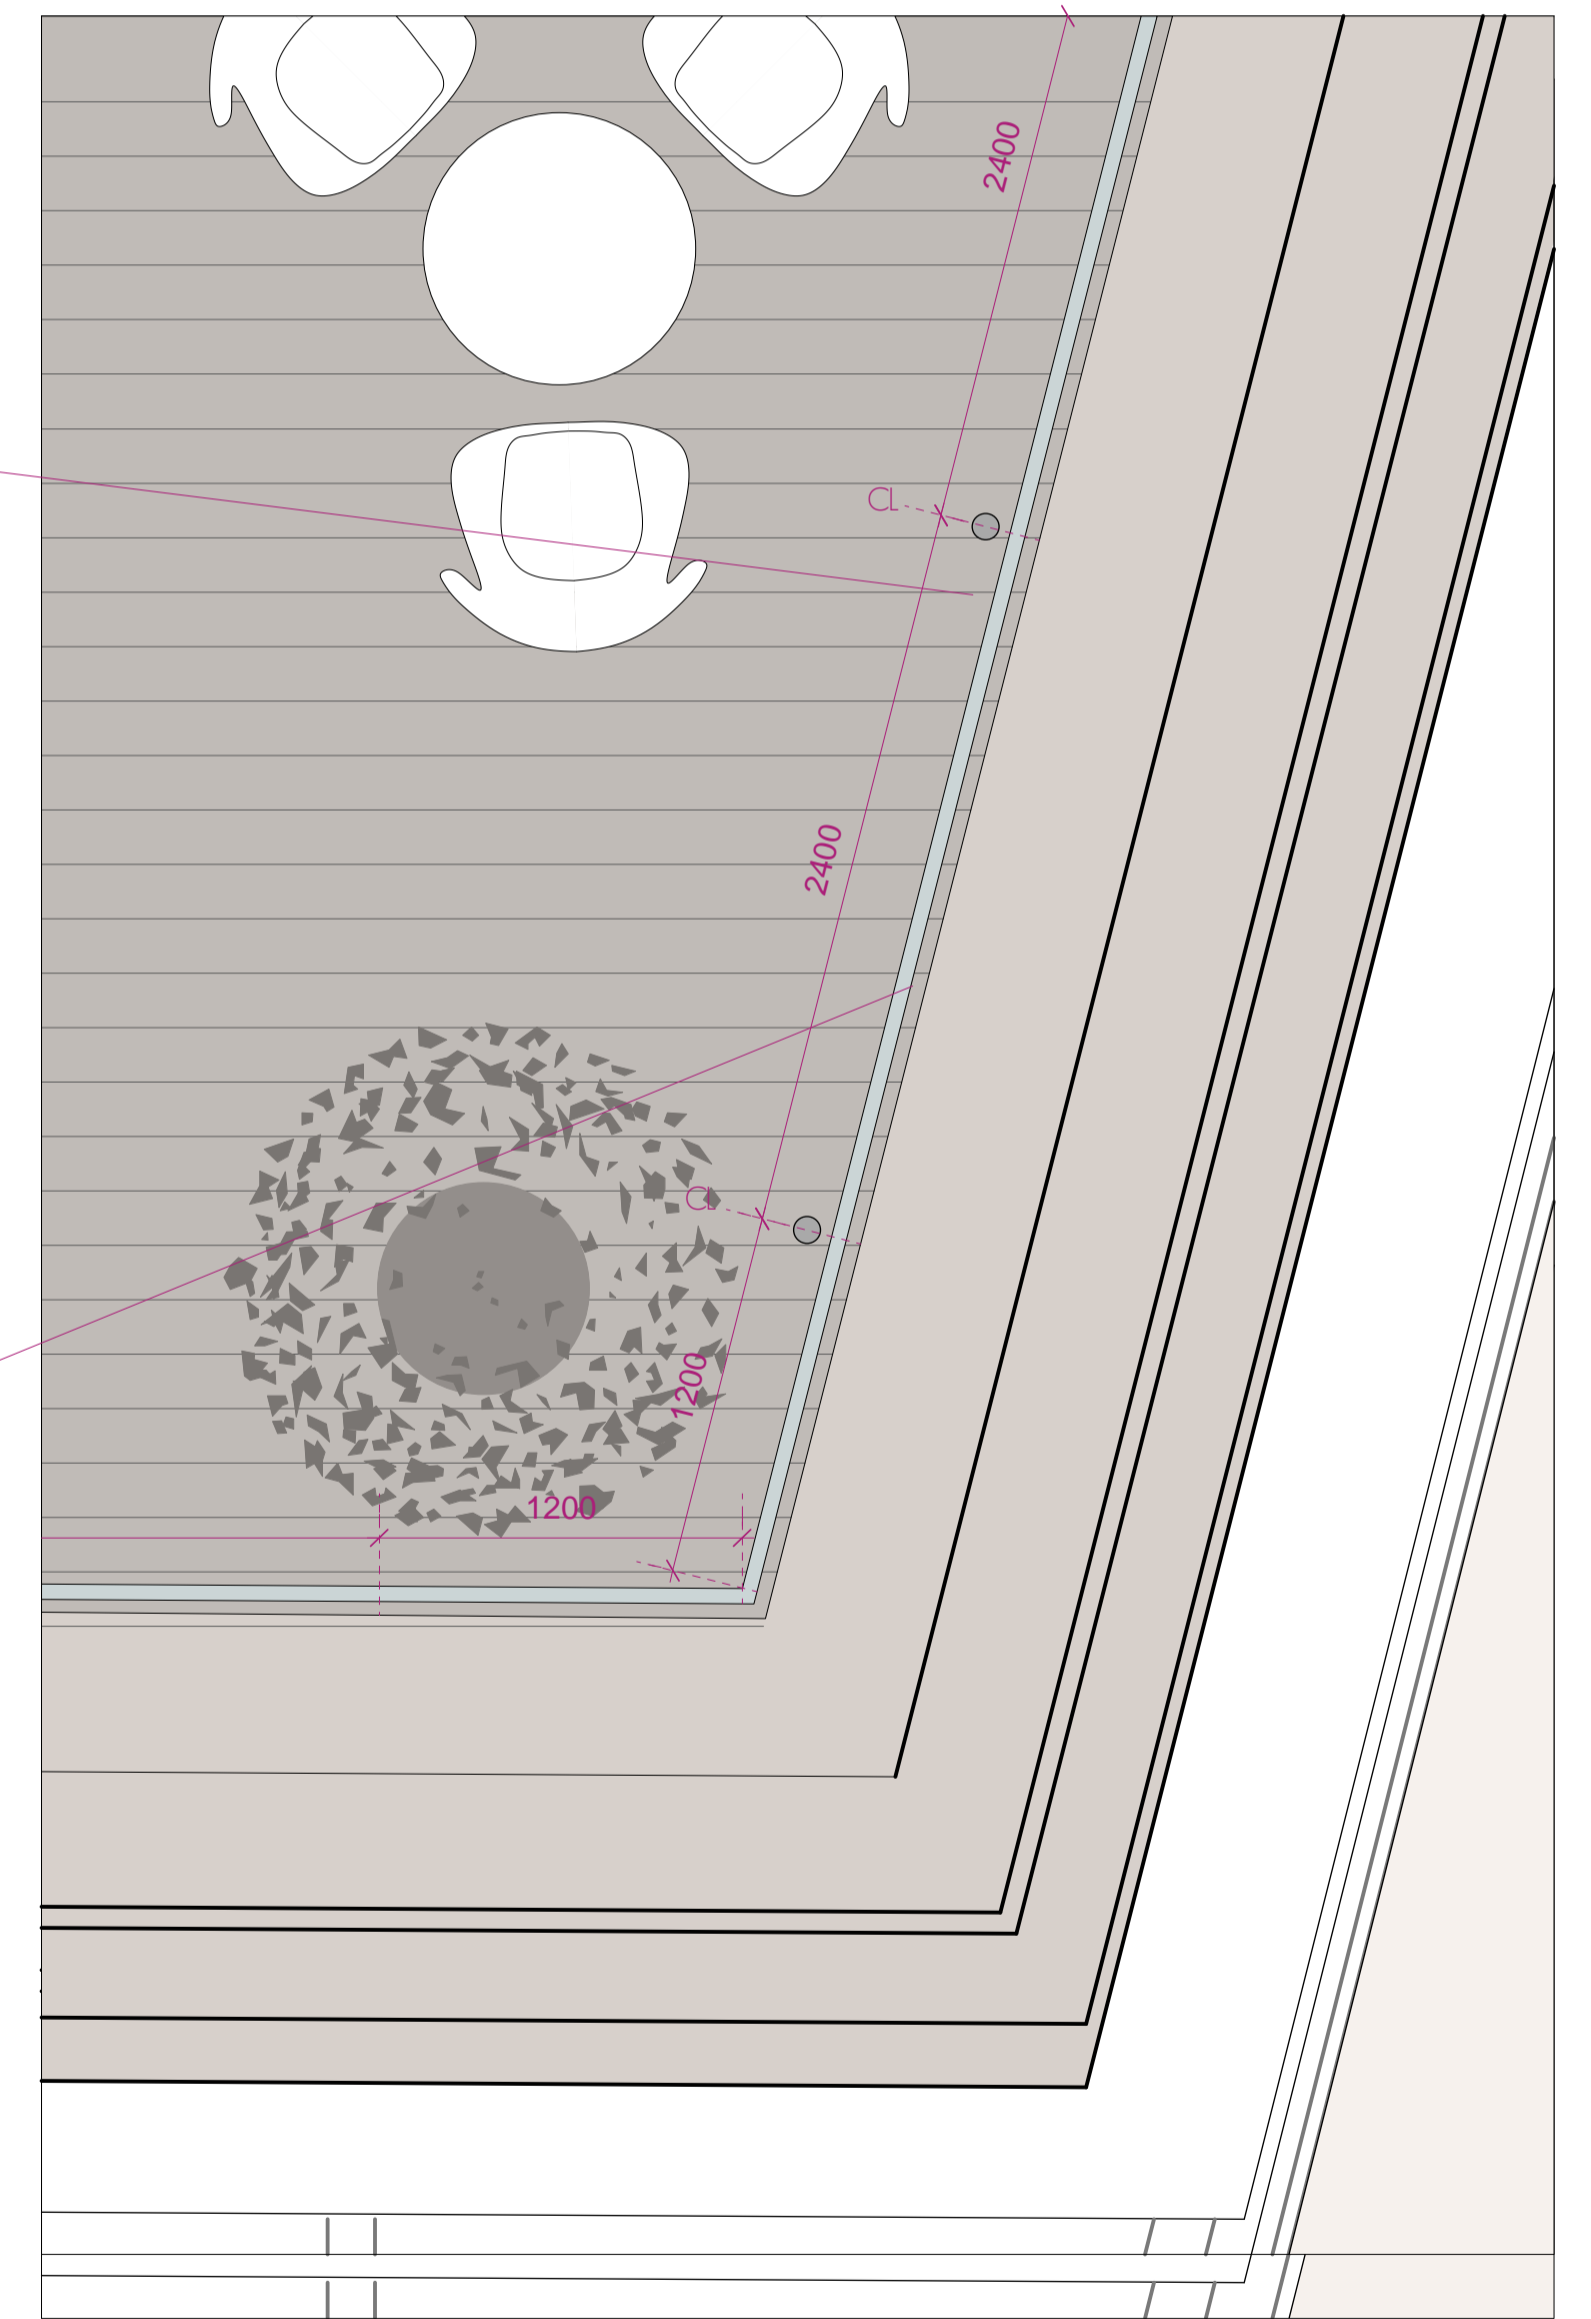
DETAIL iGuzzini 'Typha' 13 Feature Luminaires
